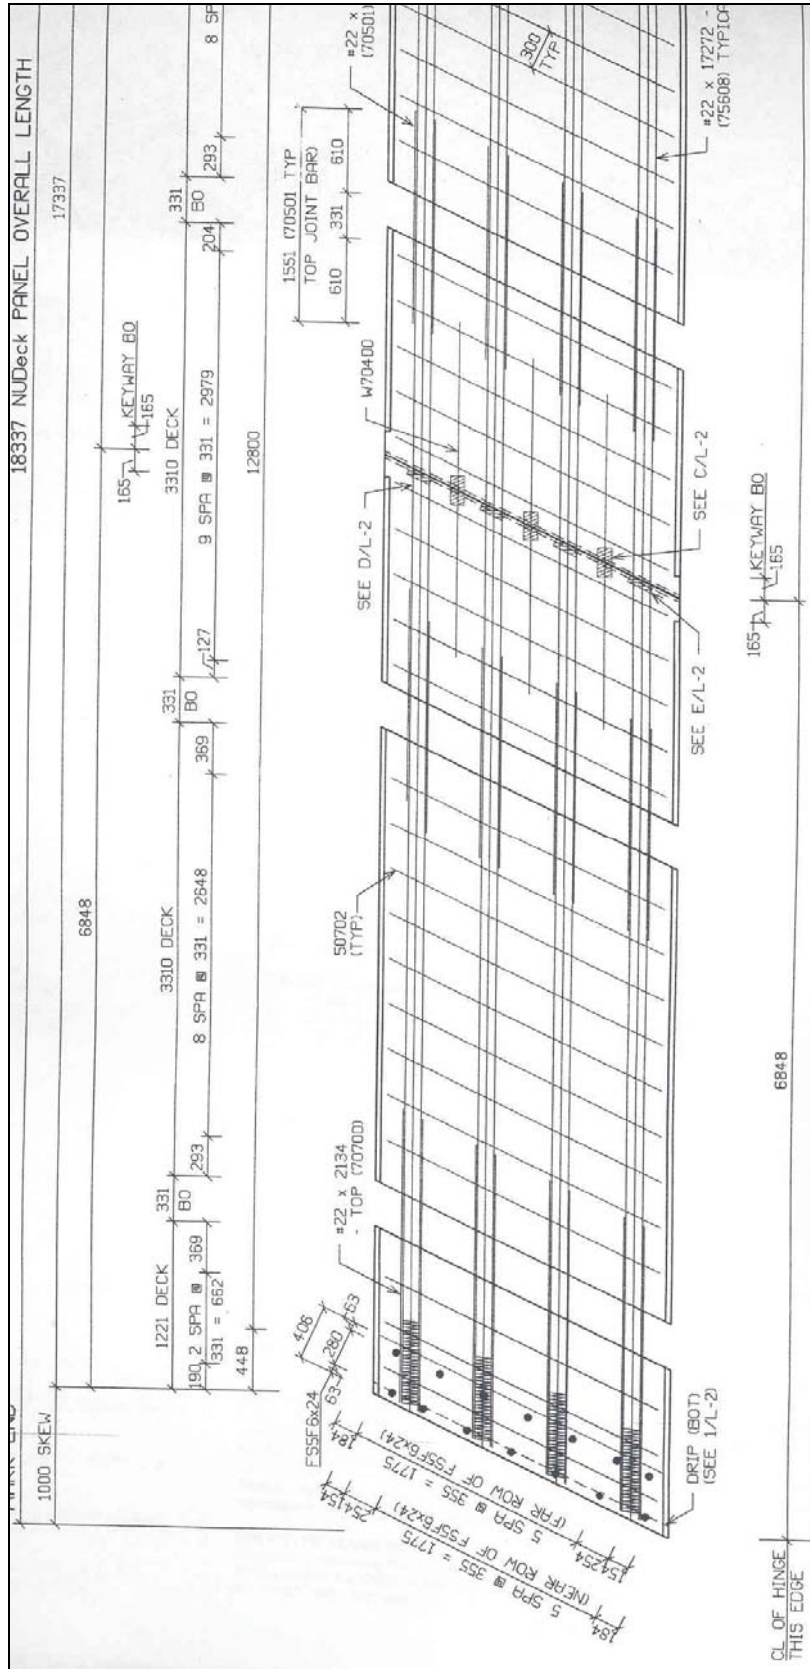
Typical NU-Deck panel plan view (NDOR, 2003)
